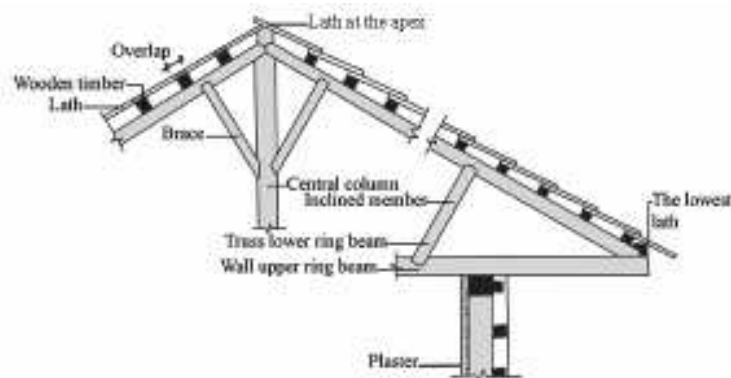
A *latpush* roof: use of truss made of elements with a square cross-section, and laths for final covering
